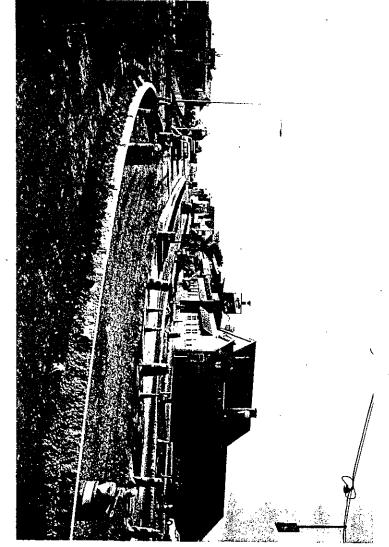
General Project Area - Lake Avenue from 4653 Lake Avenue, looking south.
